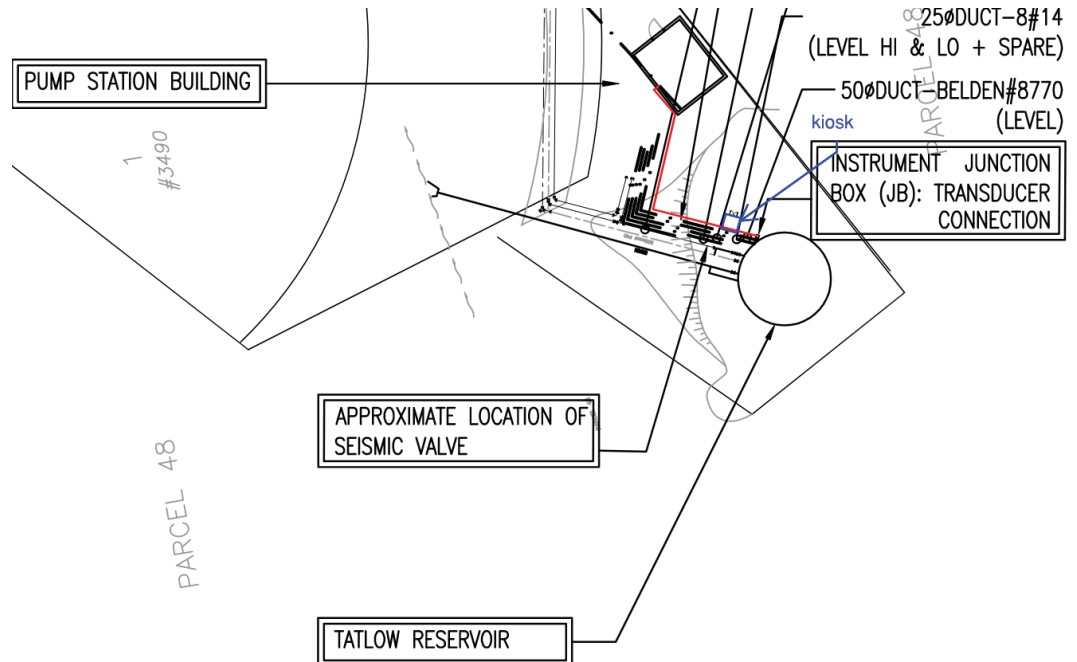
Proposed alignment and location of buried piping, conduit, and pad-mounted kiosks
